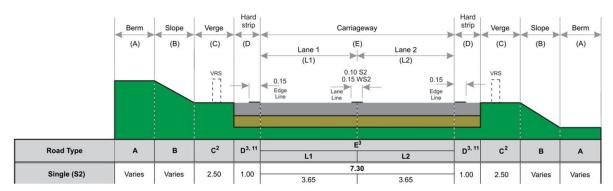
Illustrative Cross-Section of the proposed Southern Link Road
